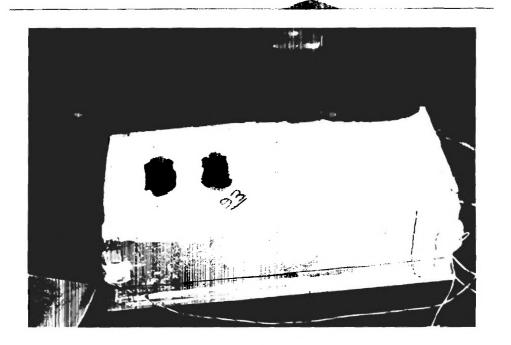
View of fractured G brick with 1/16 in. LDP contact material
